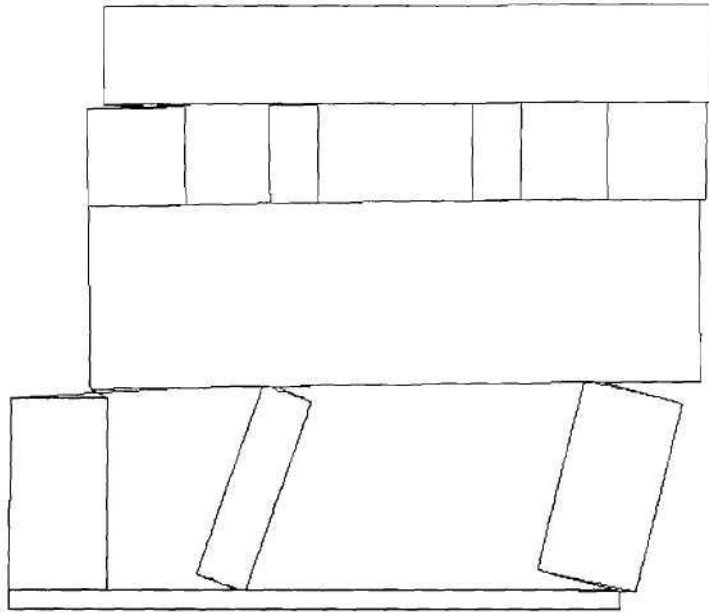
Deformed shape of Wall 2 (loaded to the right)
